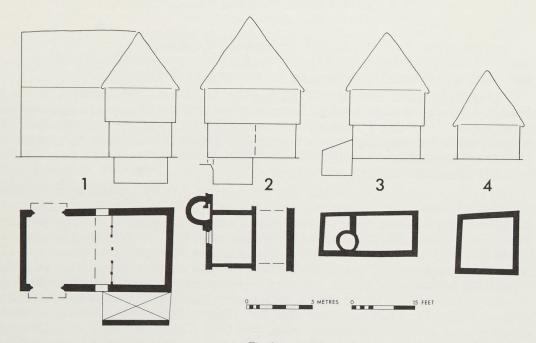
Outline plans and sketch sections of Pykerell's House (1) and three of the Pottergate, 149N, buildings: J/M (2), R/V (3) & P (4).
